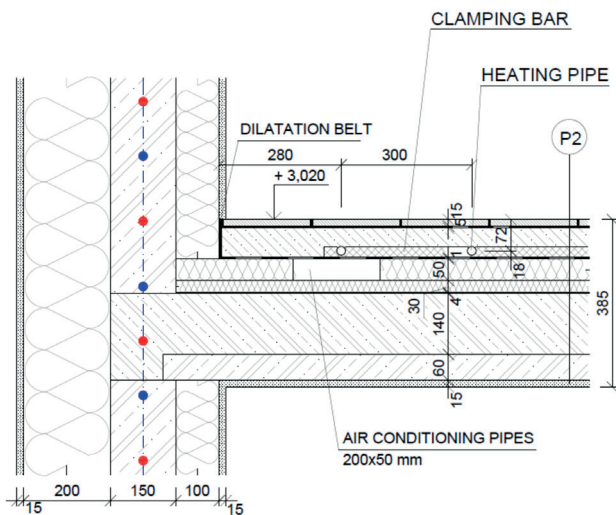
Detail of the location of the floor heating pipes and the thermal barrier [2]
